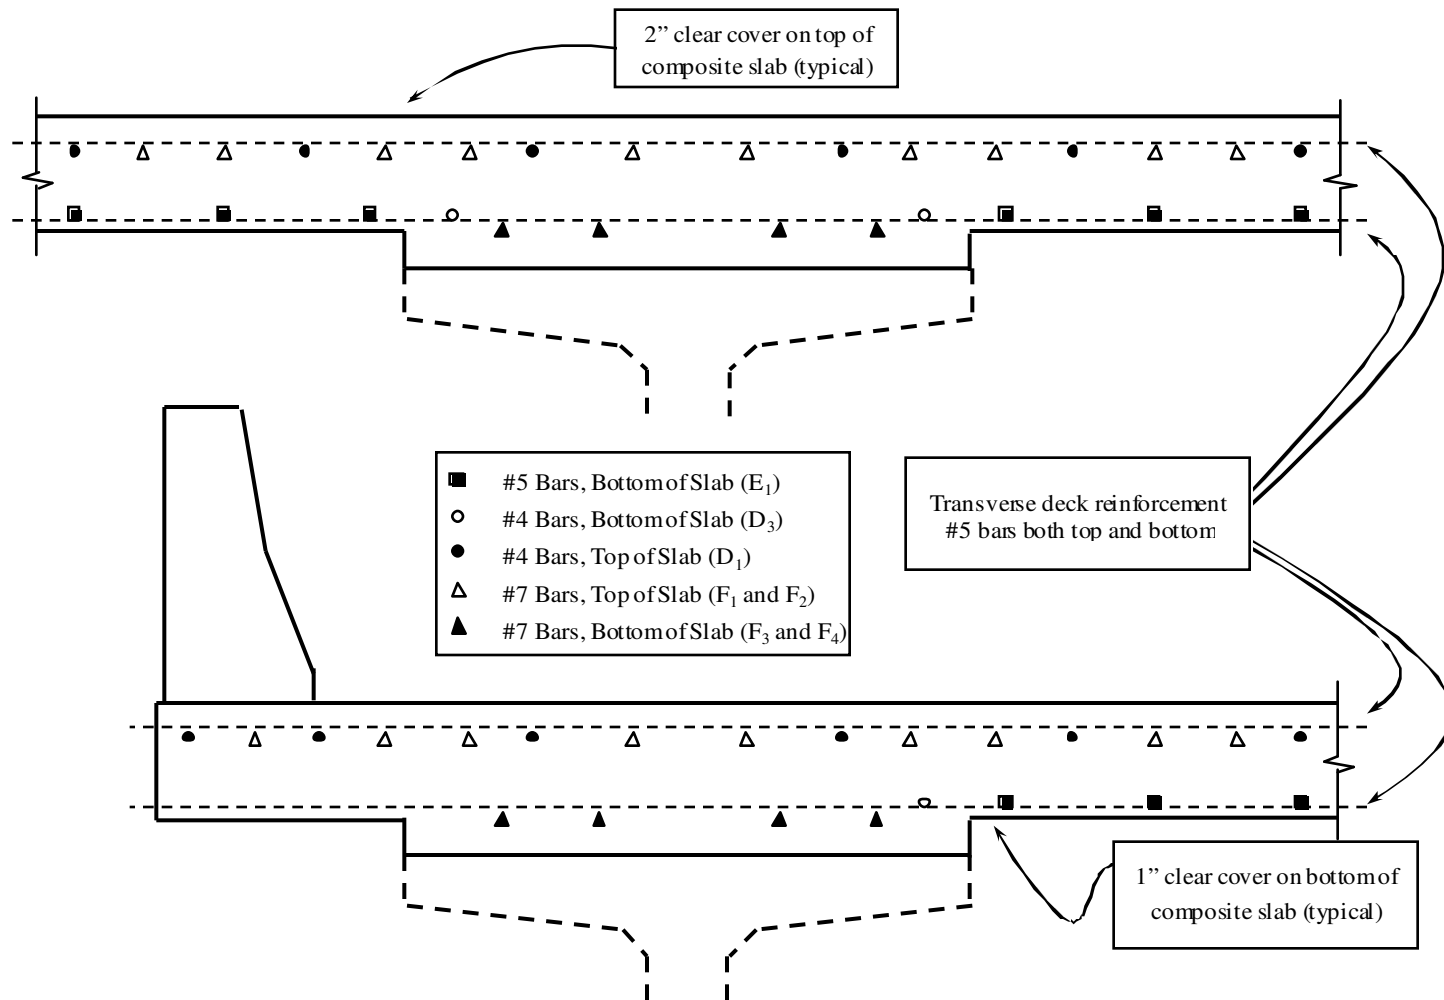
Longitudinal Mild Steel Reinforcement in the Deck Slab (Swenson 2003a)
